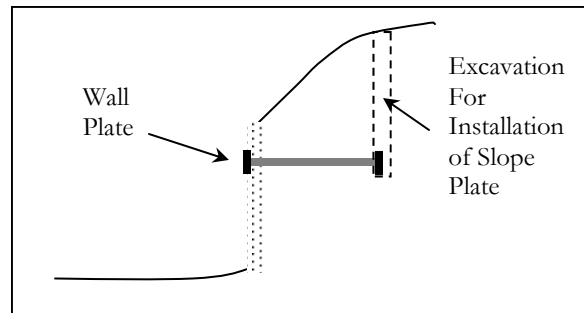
B. Plate anchors require excavation of a vertical hole to connect soil plate to metal rod. Plate surface area proportional to holding strength.
